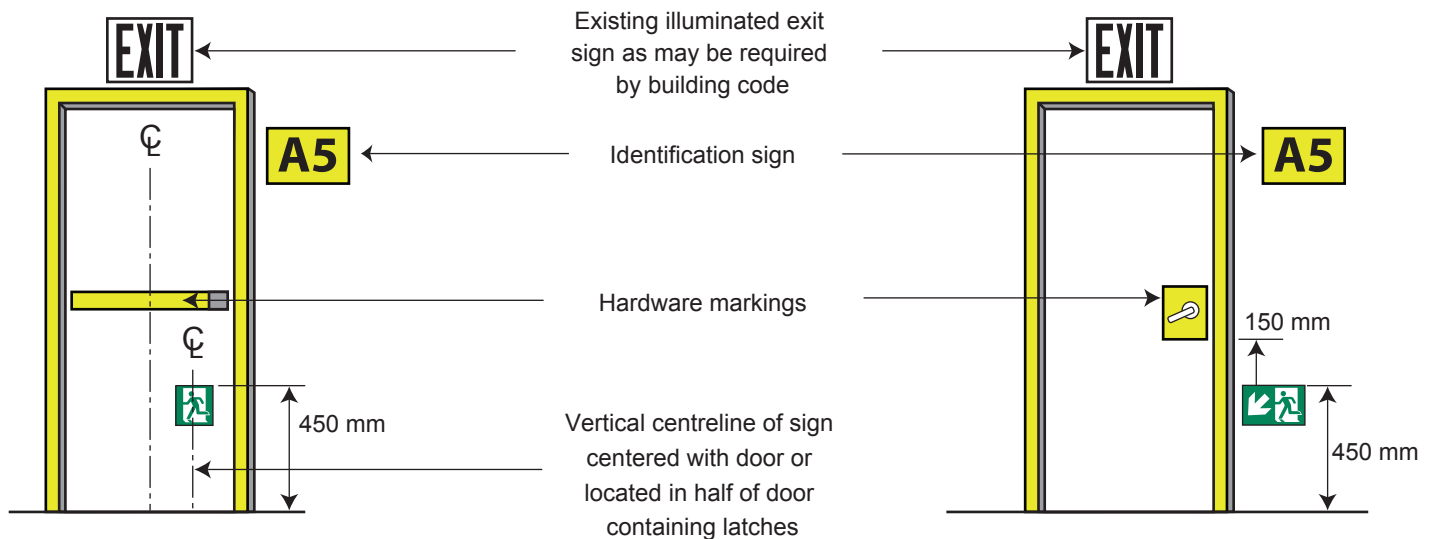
Signs at exit doors: door-mounted (left) and wall-mounted (right)
